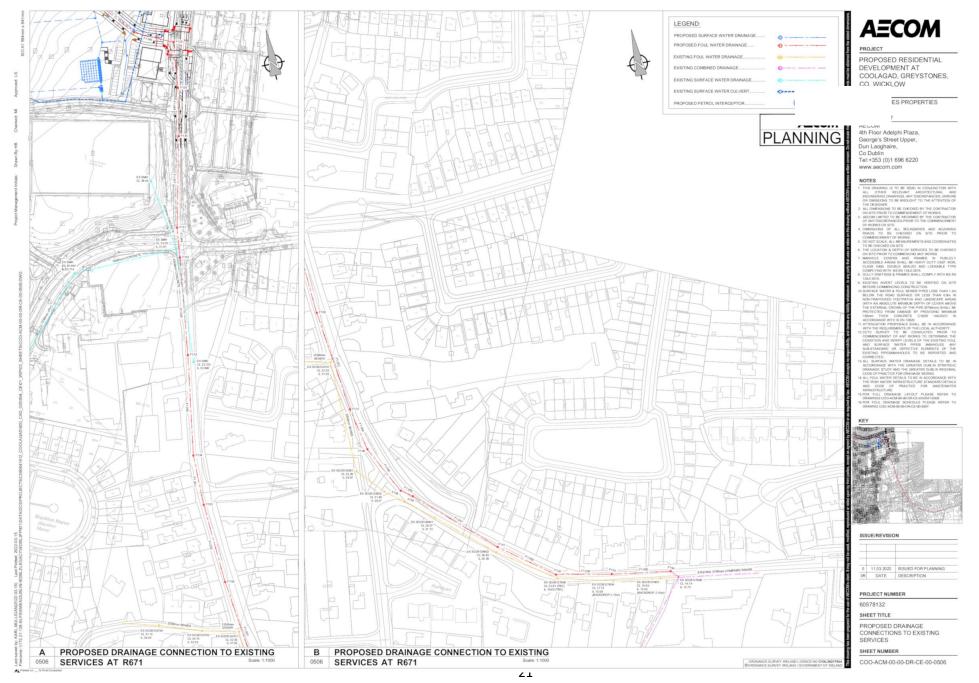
Proposed drainage connection to existing services at R671 (works proposed to install foul sewer.
